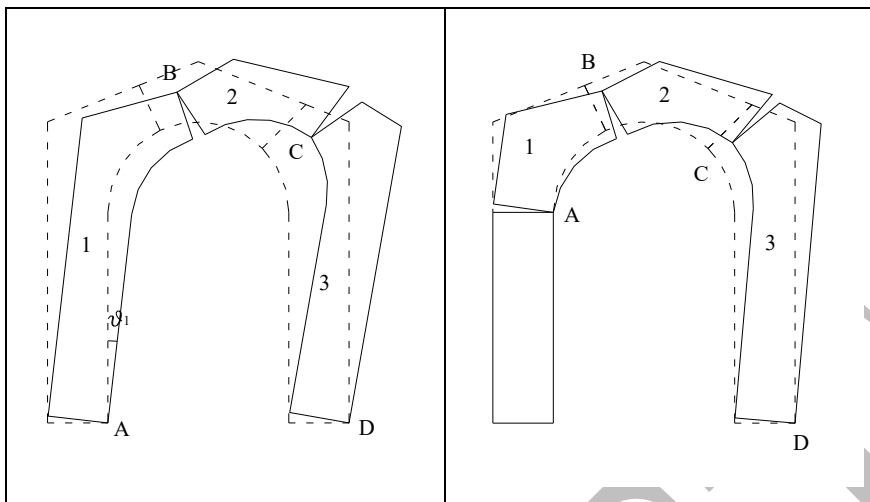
Class D – Damage to arched systems: possible mechanisms of the single-nave arch-pillars system.
